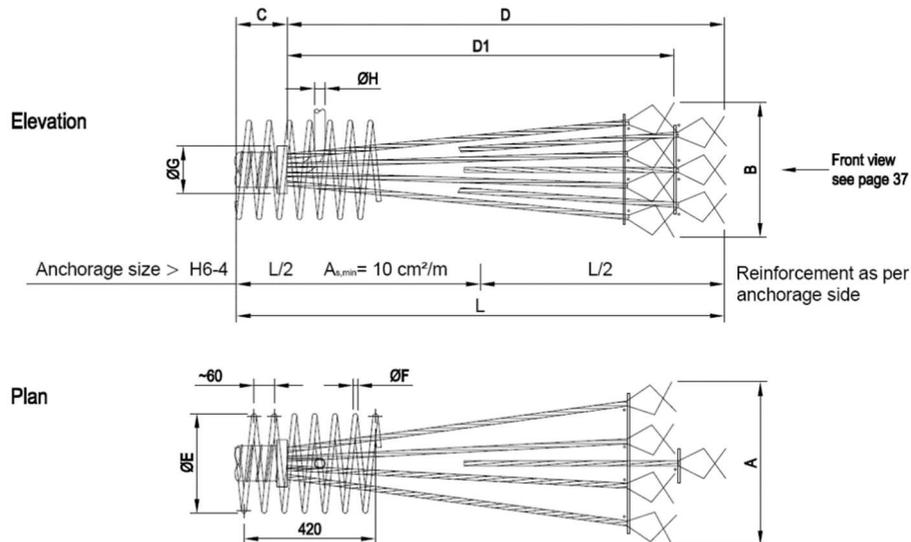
Anchorage and local anchorage reinforcement type H @ 28/35 MPa
